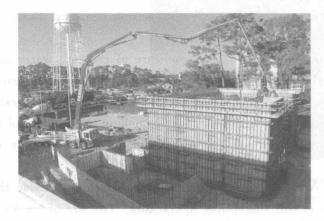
Concrete pour for a cast-in-place concrete construction
